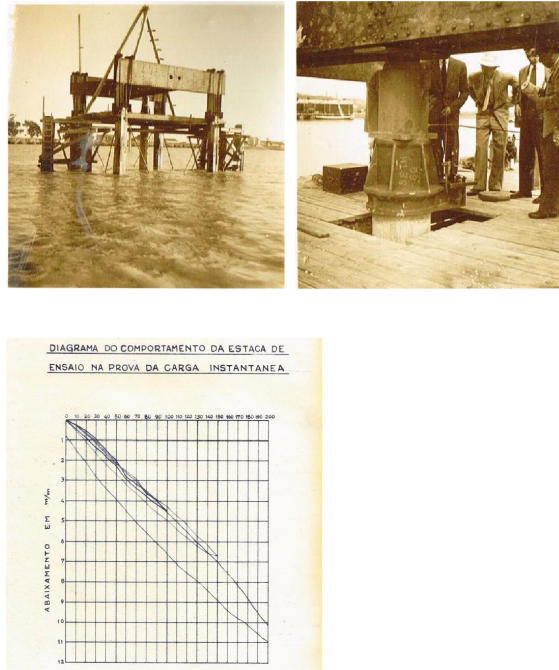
Pile tests at the site of the Vila Franca de Xira Bridge [14] Lopes Alves
